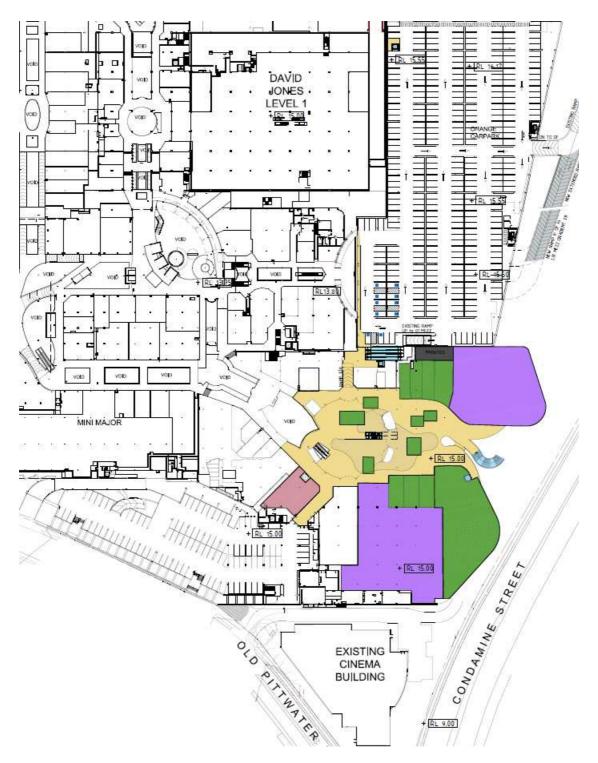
Part Retail Level 1 floor plan showing the proposed retail and carparking areas
